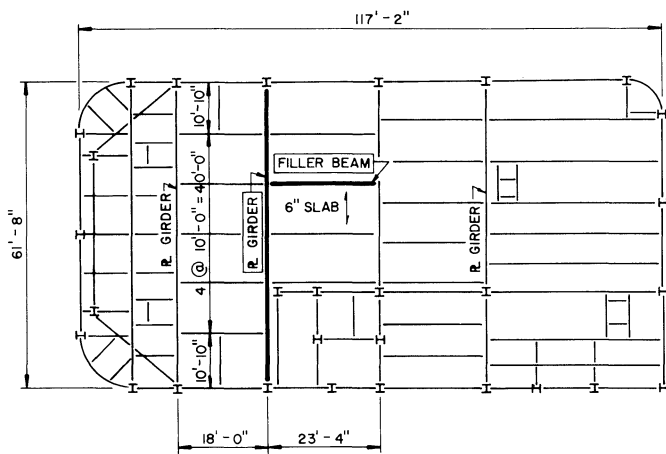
Project B—Industrial building floor system: brewhouse floor framing plan
